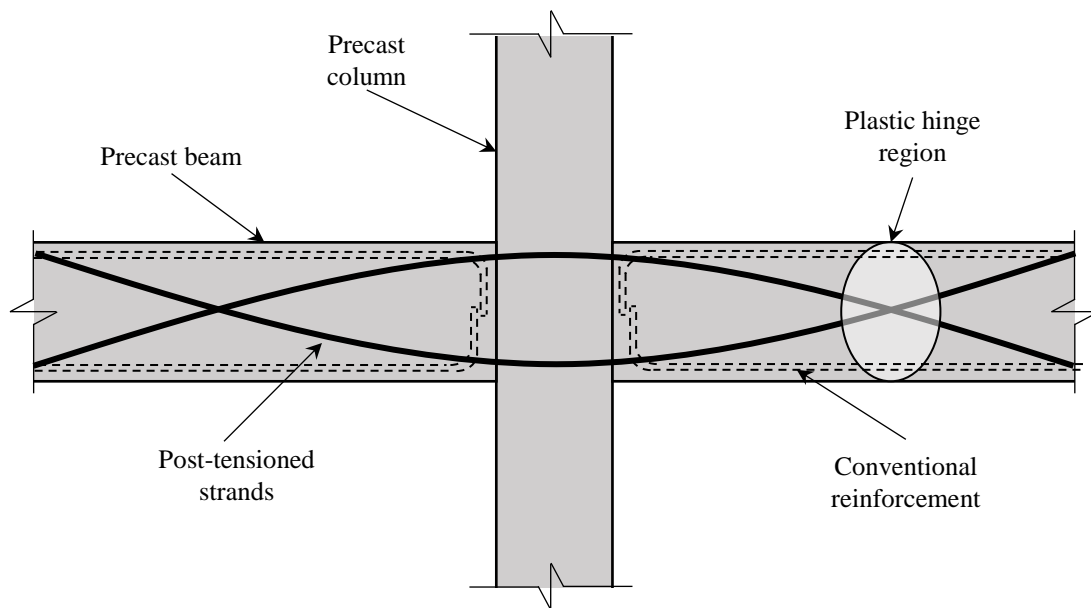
Strong nonyielding beam-column connection (adapted from [12]).
